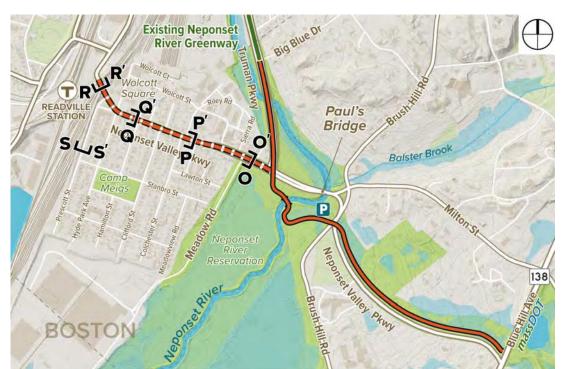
Neponset River Greenway to Readville: Sections Key Plan
